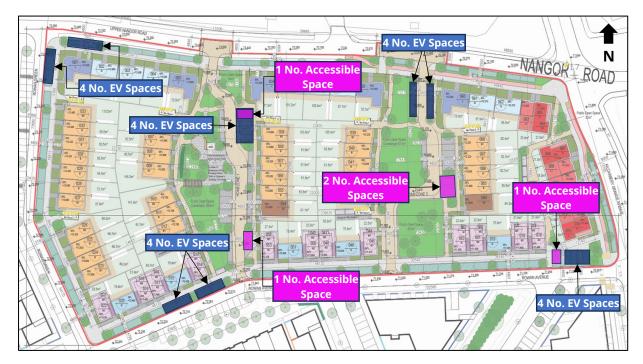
Proposed Car Parking Layout (Source: Burke-Kennedy Doyle Architects)
